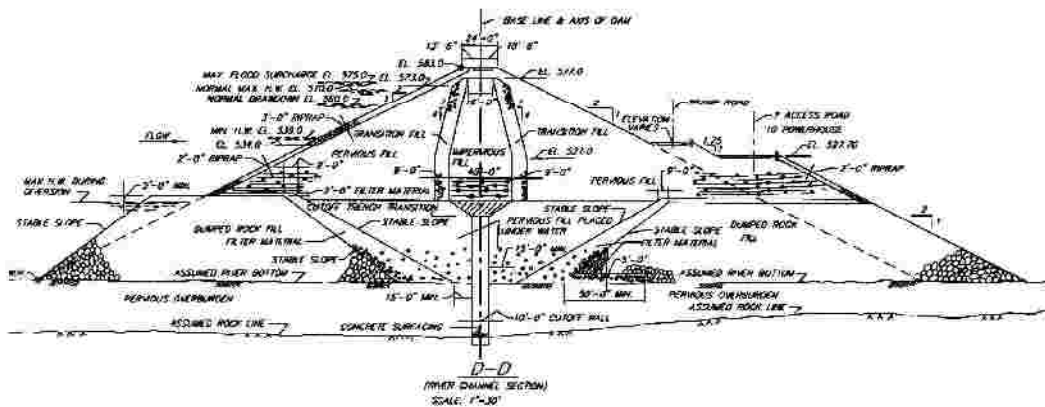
Cross section at Columbia River crossing (dimensions in feet and inches)
